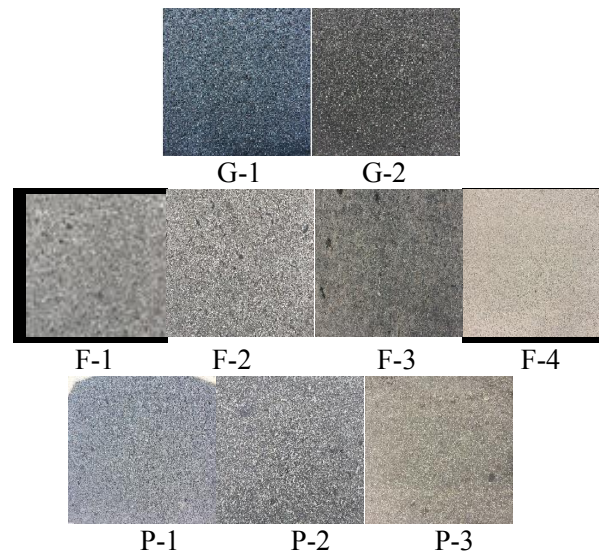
Standard Asphalt Pavement Condition (SAPC)
